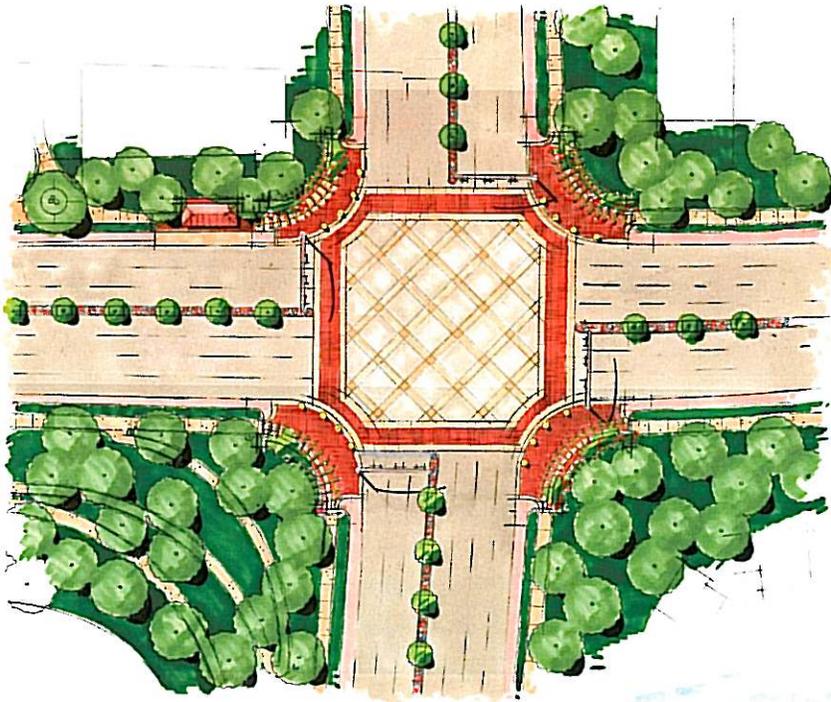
Plan view of intersection enhancements with special paving, crosswalks, street lighting and ramps
